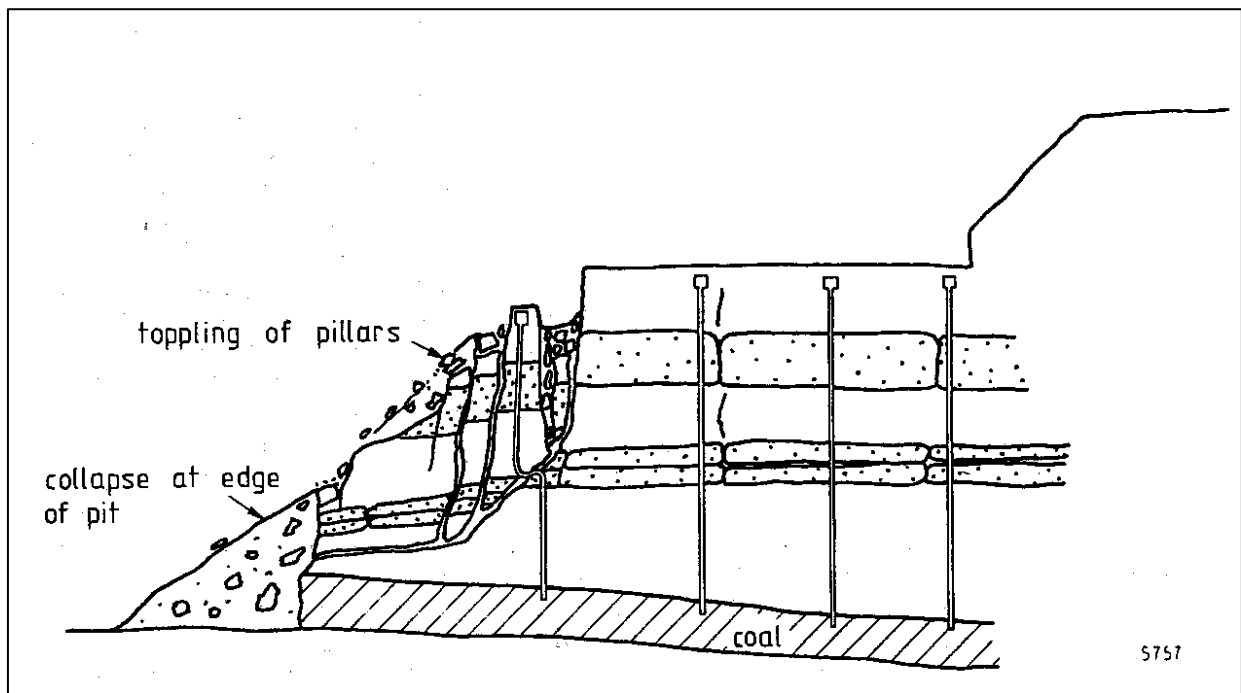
B – Damage Showing Vertical and Horizontal Cracks (after CSIRO 1983 Report)
